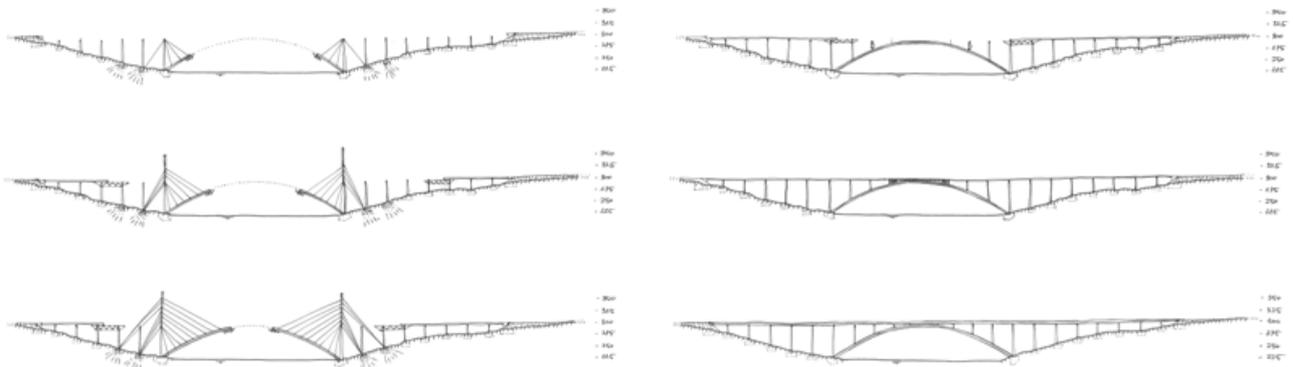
Construction alt. 1. Pylon-method cantilever erection of the arch using provisional pylons
